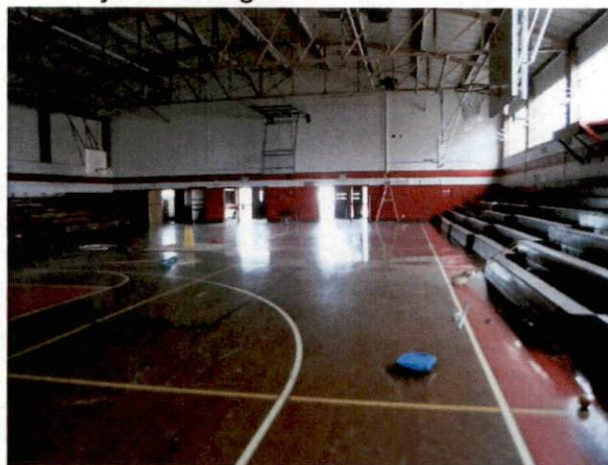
View of gym with HA 24, asbestos-containing interior window caulk.
